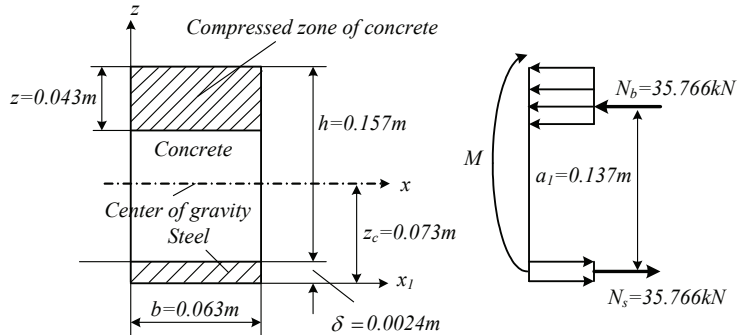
Cross-section of the steel-concrete beam and longitudinal forces: a – the beam cross-section; b – longitudinal forces
